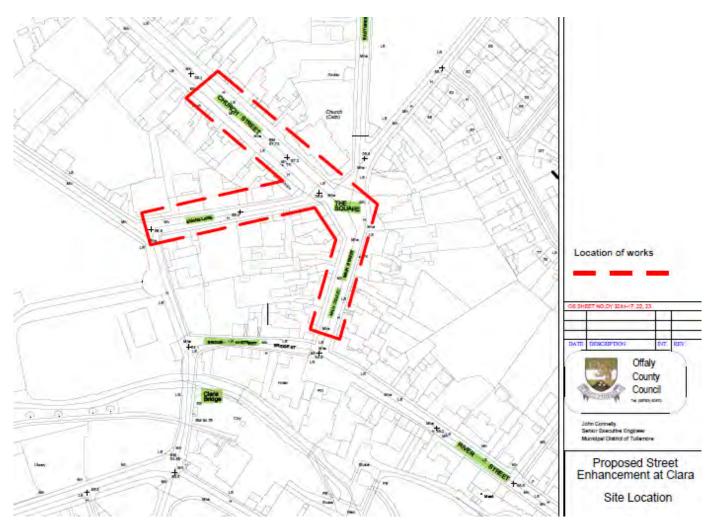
Proposed Site Layout (Part 8 Scheme)
